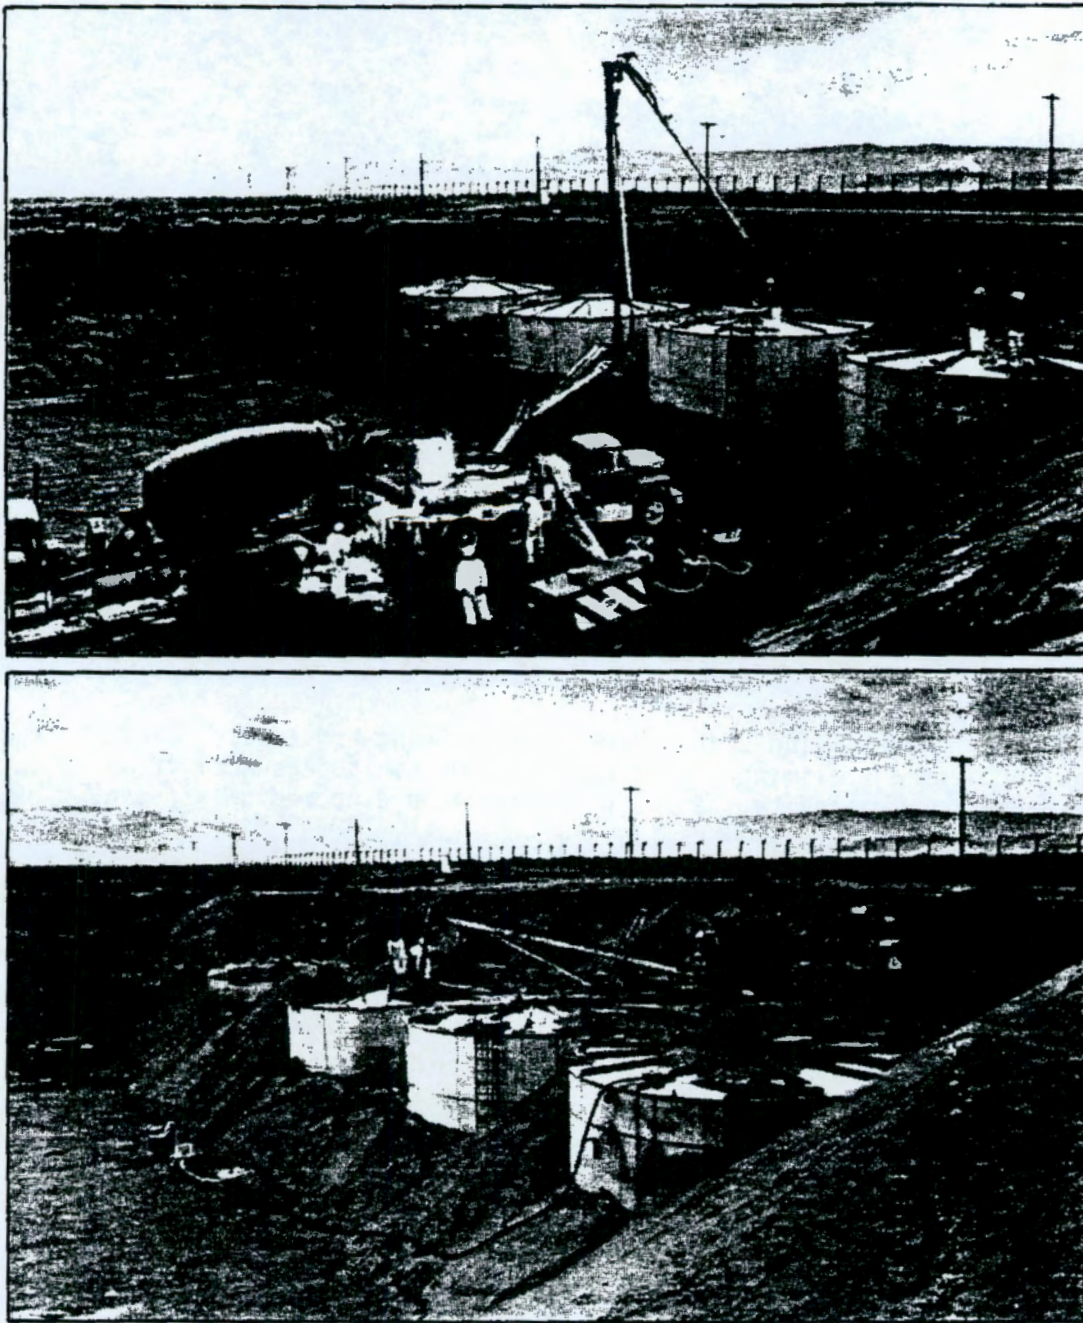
Filling the 204-S Tanks with Concrete and Sand. A concrete pumping truck (top) poured 10-20 yd of concrete into each vessel to seal the sludge remaining on the tank floors with a concrete cap. A front-end loader and conveyor belt then proceeded to fill the vessels with sand through six openings cut into the tank tops.
